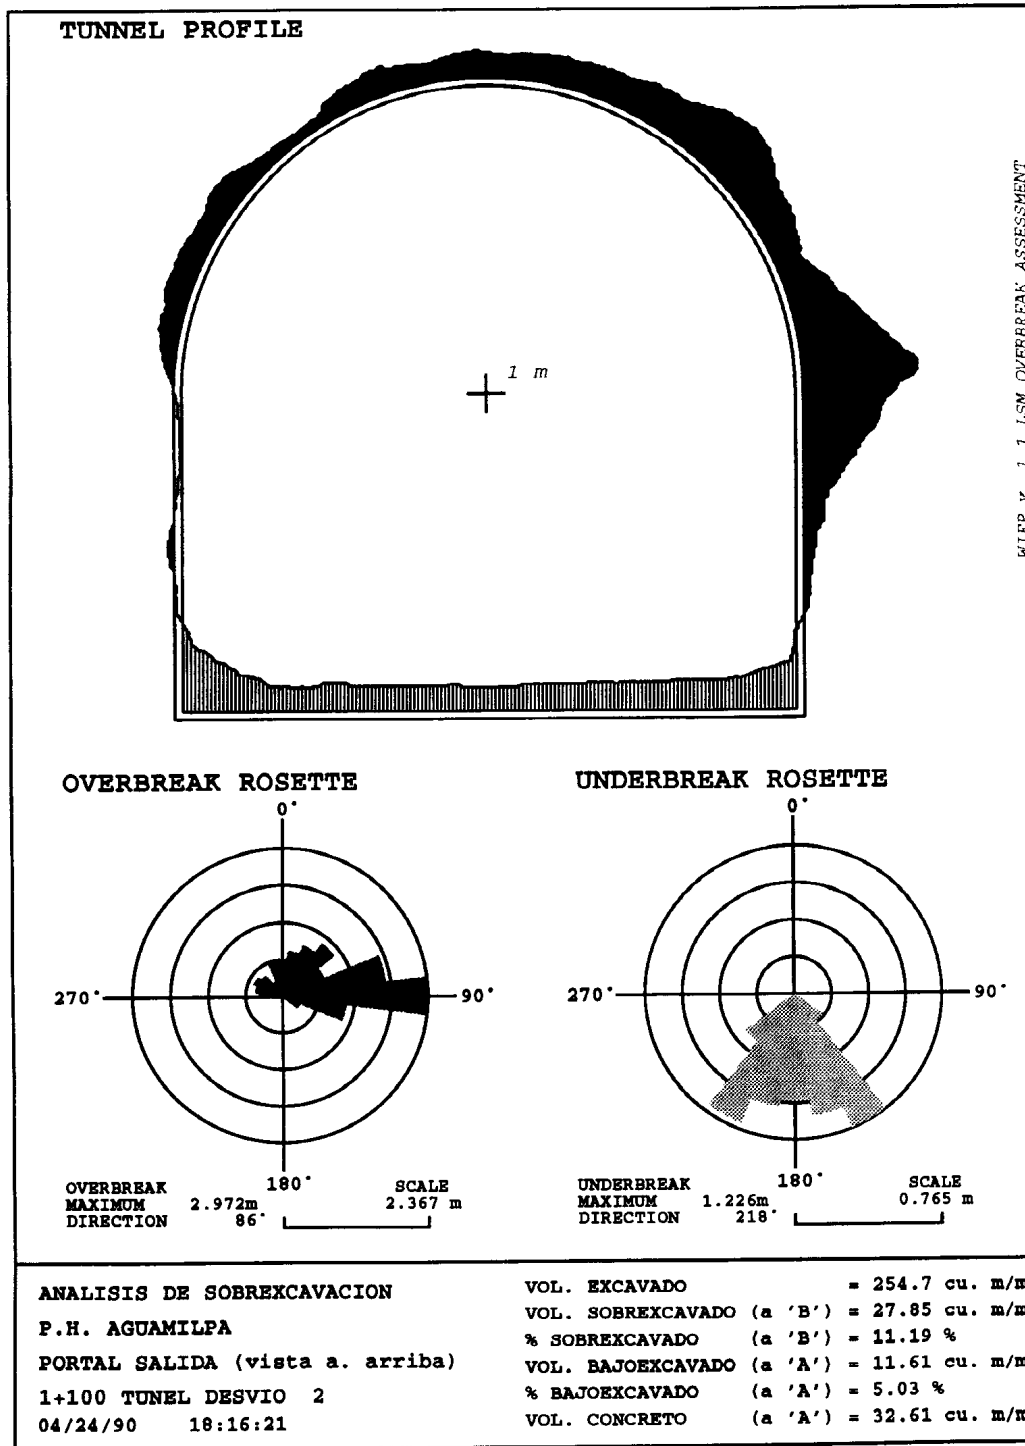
Analysis of overbreak and underbreak in a section of the diversion tunnel, showing a vertical tunnel misalignment, and backbreak along jointing planes
